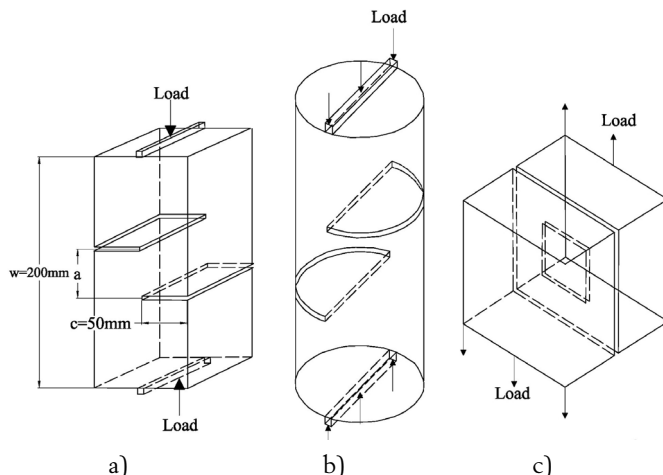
Shear test specimens used by Barr *et al.* [8] a) double-notch beam specimen, b) cylinder double-notch specimen and c) compact cube specimen.
